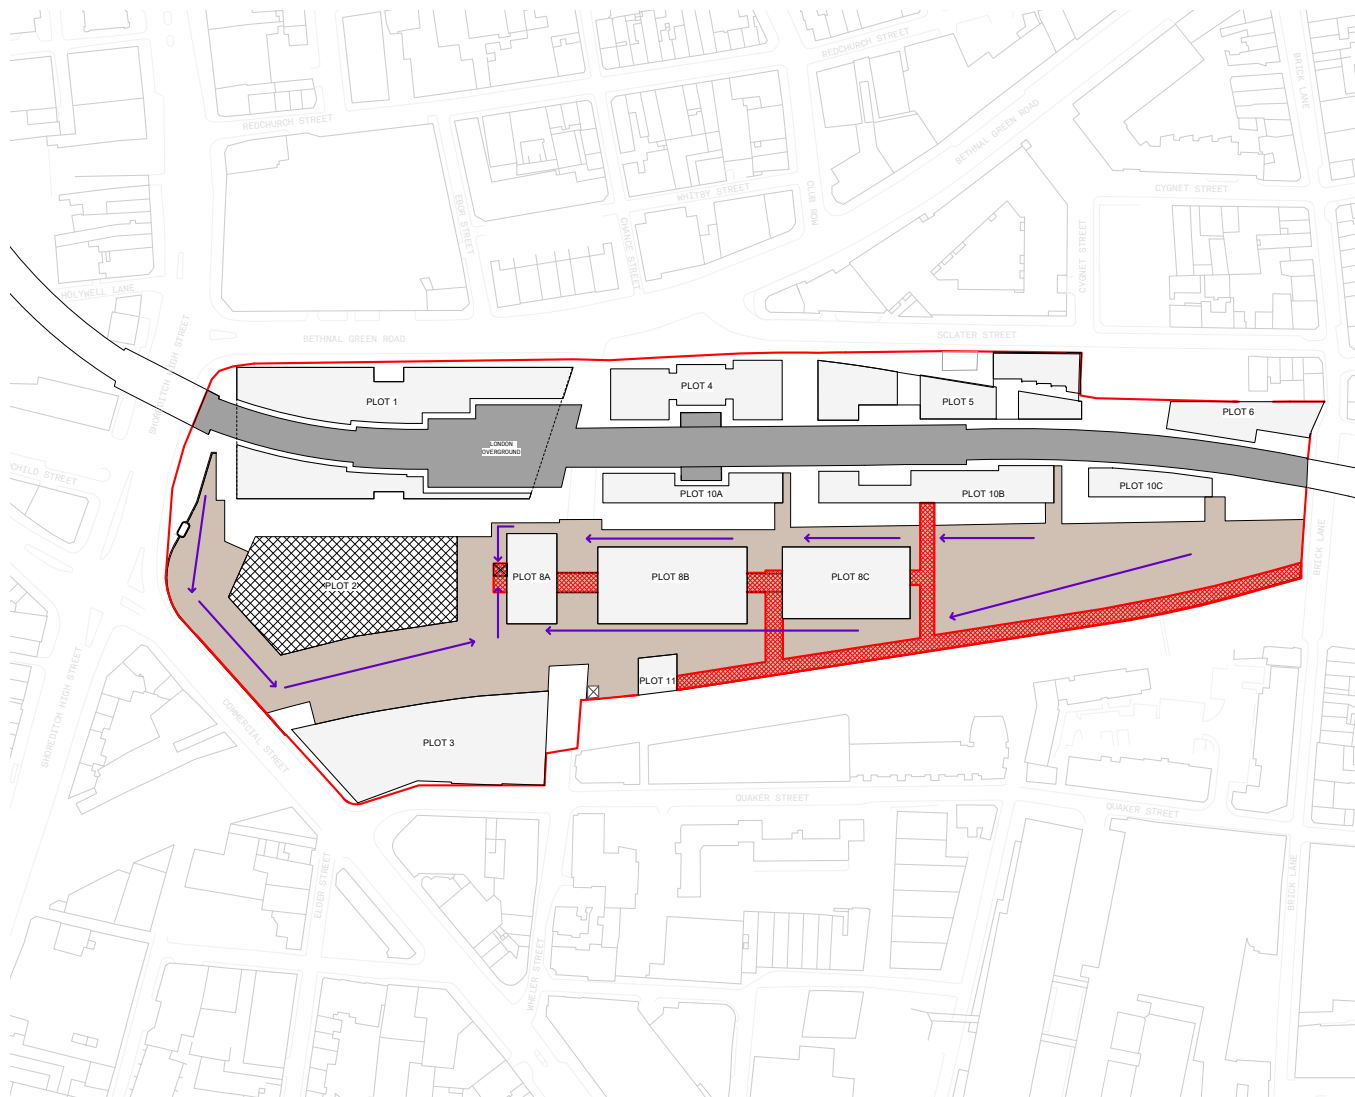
Podium Level Plan showing Function and Servicing
